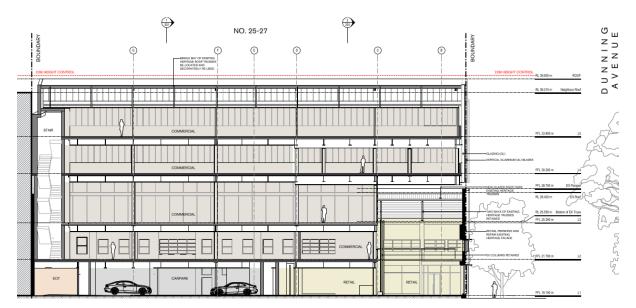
Proposed Section Plan 1 looking from north to south through the building
